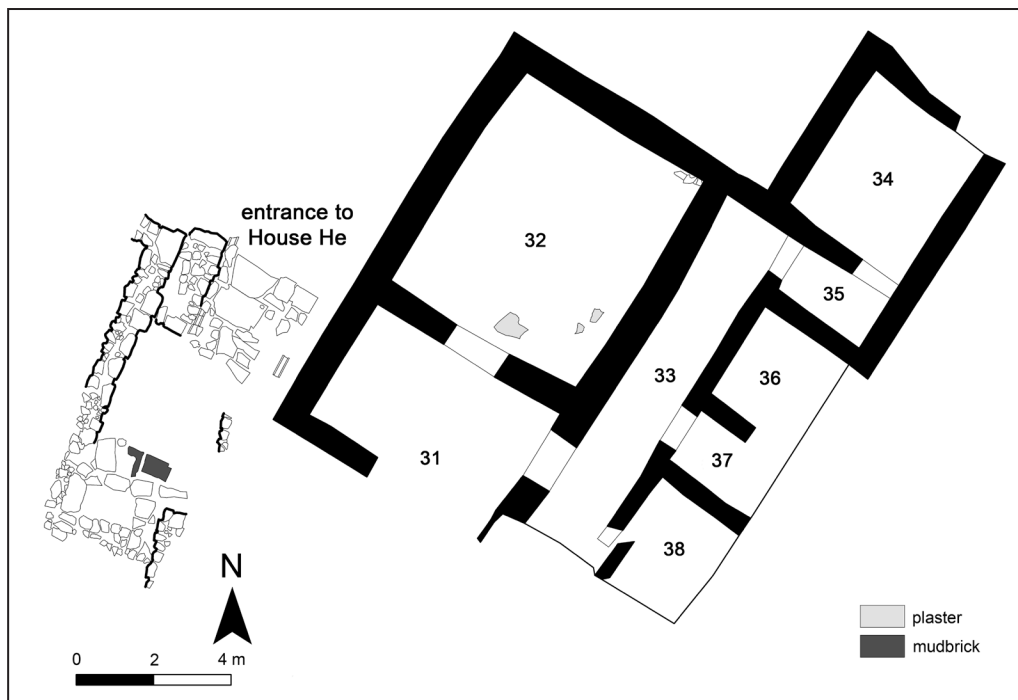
Plan of House He. Solid walls are from Boyd Hawes's 1908 plan. Drawing D. M. Buell and J. McEnroe
